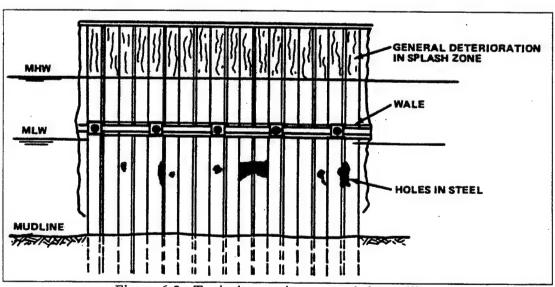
Typical corrosion on steel sheet piling.
